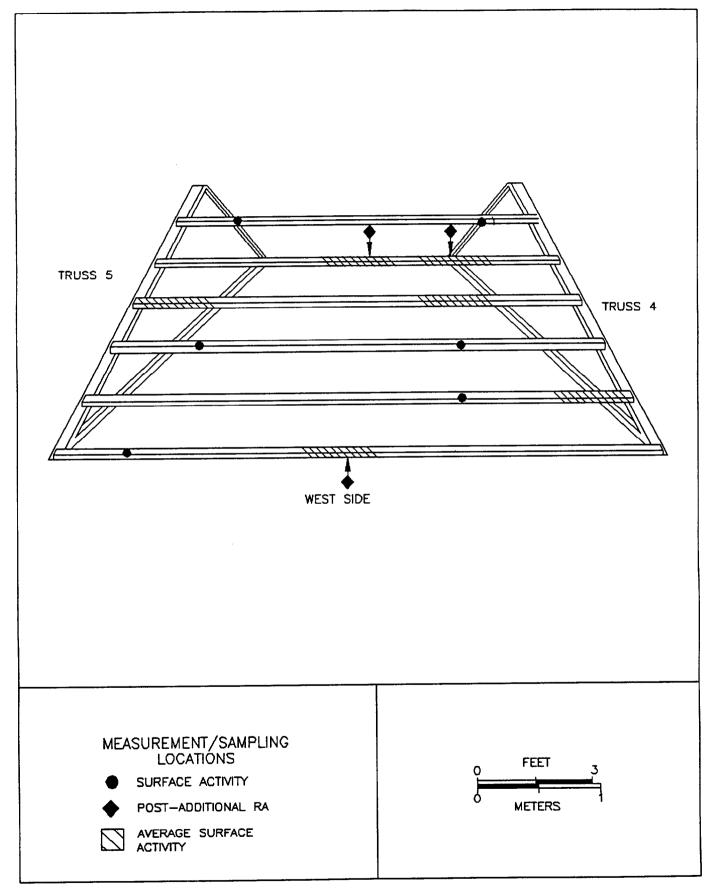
Building 3, Bay 4, West — Measurement and Sampling Locations
